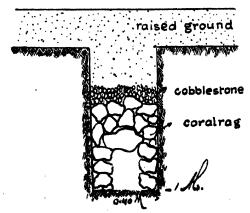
Showing method of construction of a closed drain in a section where formerly mud heaps due to crabs had caused a nuisance.
